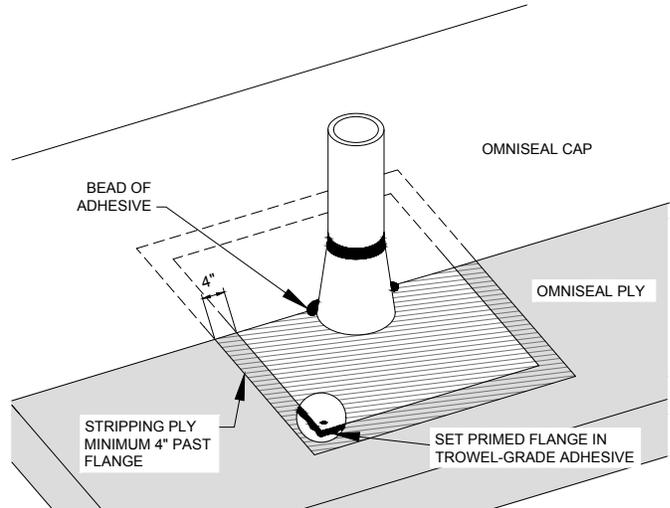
Application of the OmniSeal® System at Flanged Penetrations like a Vent Pipe
